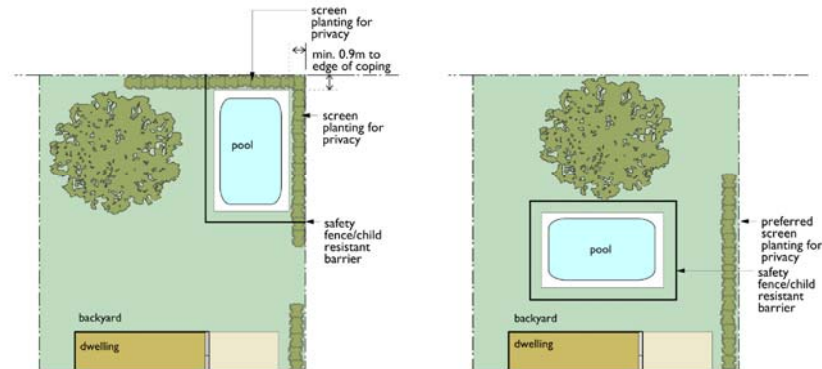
[Site plans showing different pool fencing arrangements.](#)
